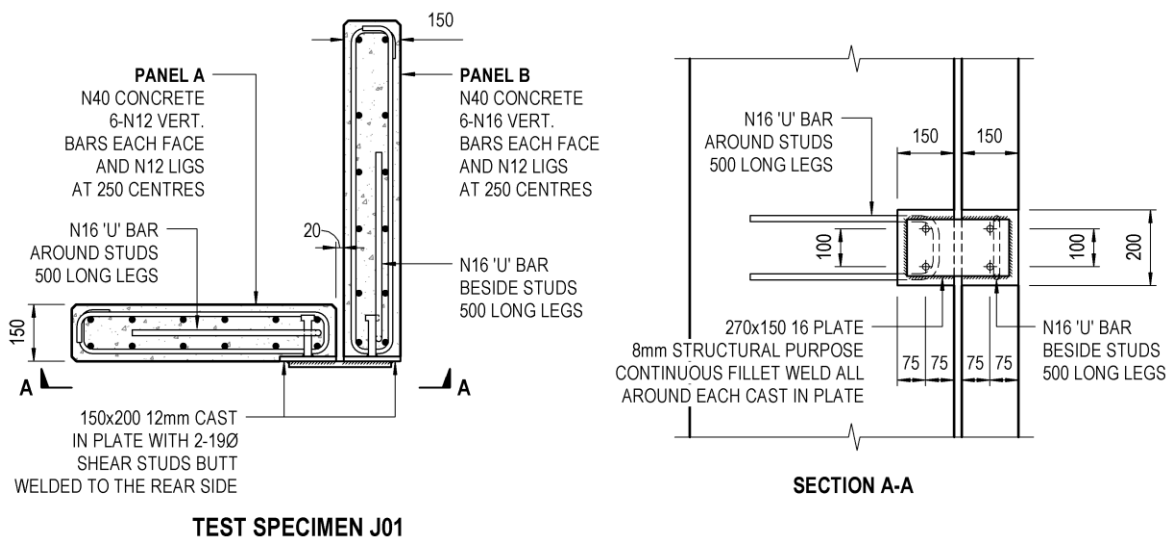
Welded stitch plate connection specimen (i.e. J01).
